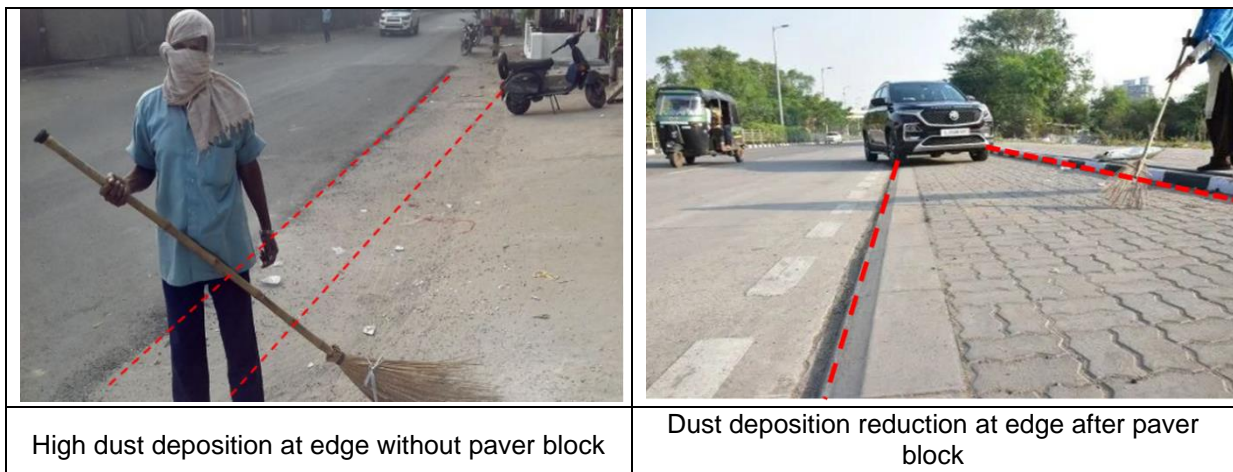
Reduction of road dust deposition by paver block at road edges
